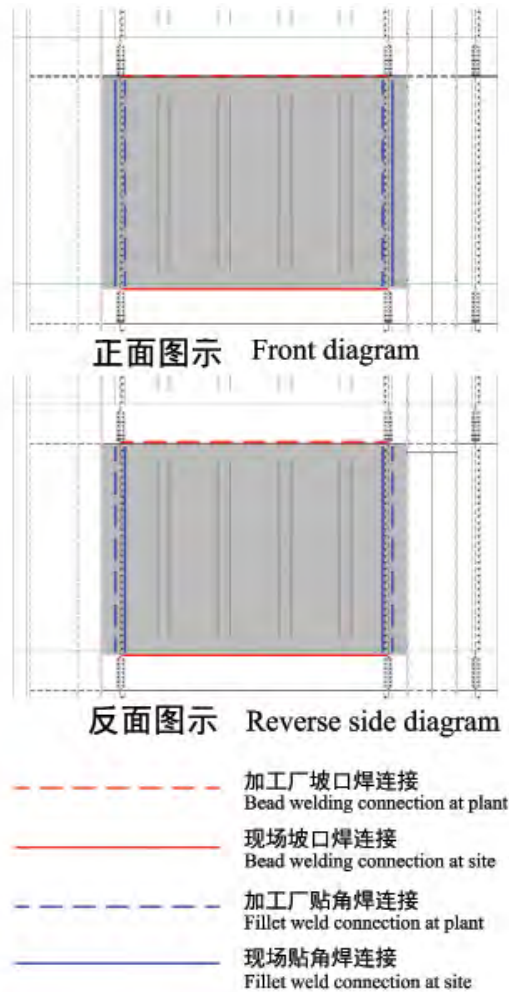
Welding seam joint design of typical floor steel plate wall (source: Yang Yaohui Gao Junfeng & Wang Jing)
